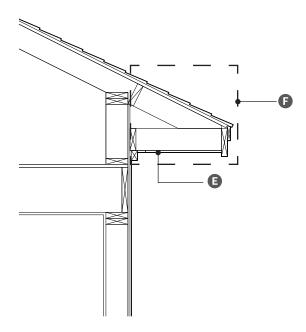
E Section detail of Highest Top Plate for pitched roof.
